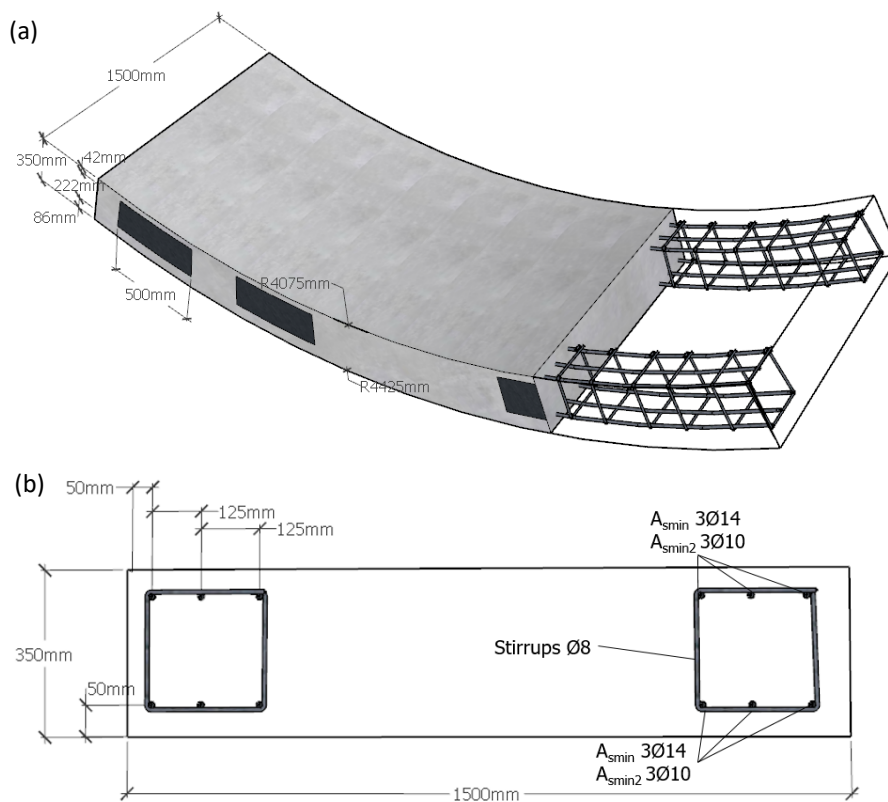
Geometrical properties of the segment (a) general layout and (b) cross section and reinforcement distribution
